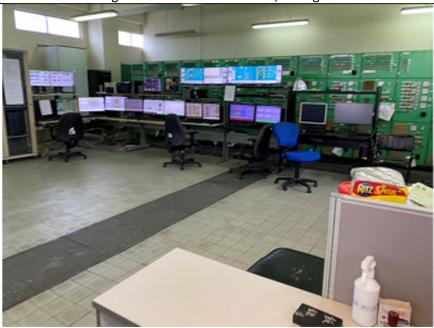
Control and Storage House (Control Room with Control Panels on Second Floor) - The floor is paved with ceramic tile and concrete in good condition. No oil stain/leakage is observed.
